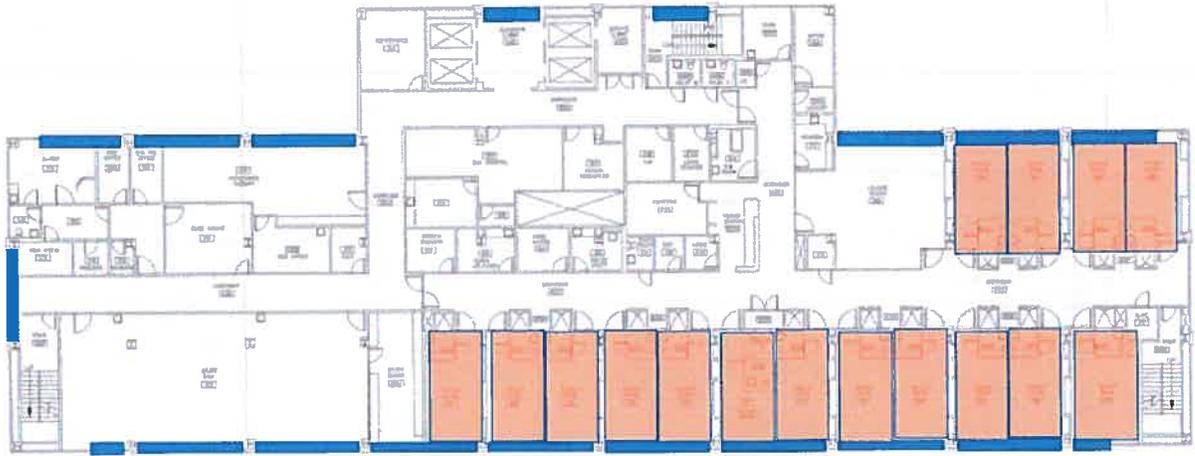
Existing Fourth Floor Layout with Patient Rooms Highlighted
